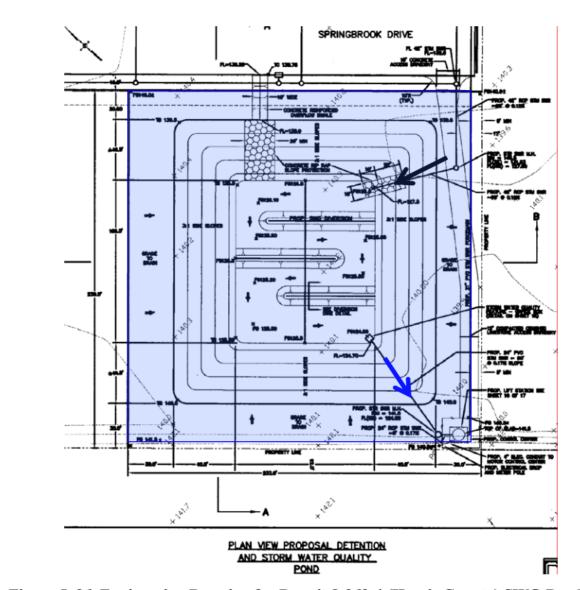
36 Engineering Drawing for Permit 8-262-4 (Harris County) SWQ Pond
